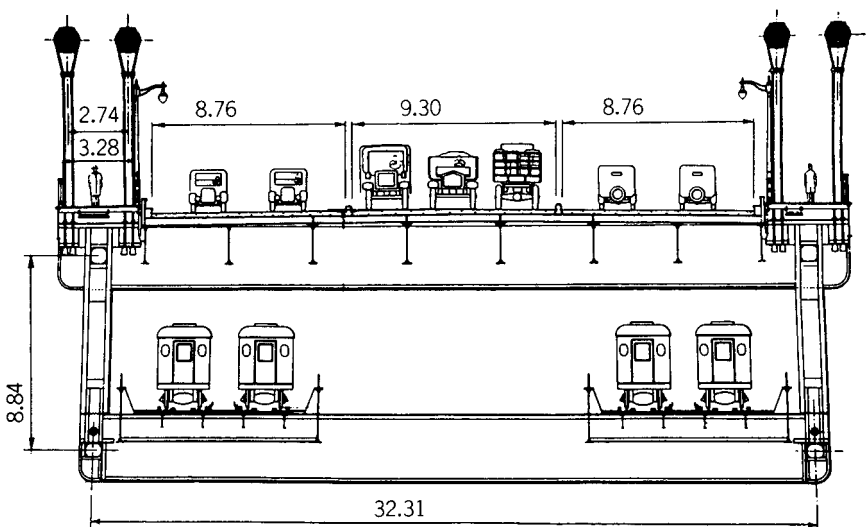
Ammann’s and Moisseiff’s original design for the George Washington Bridge truss.
